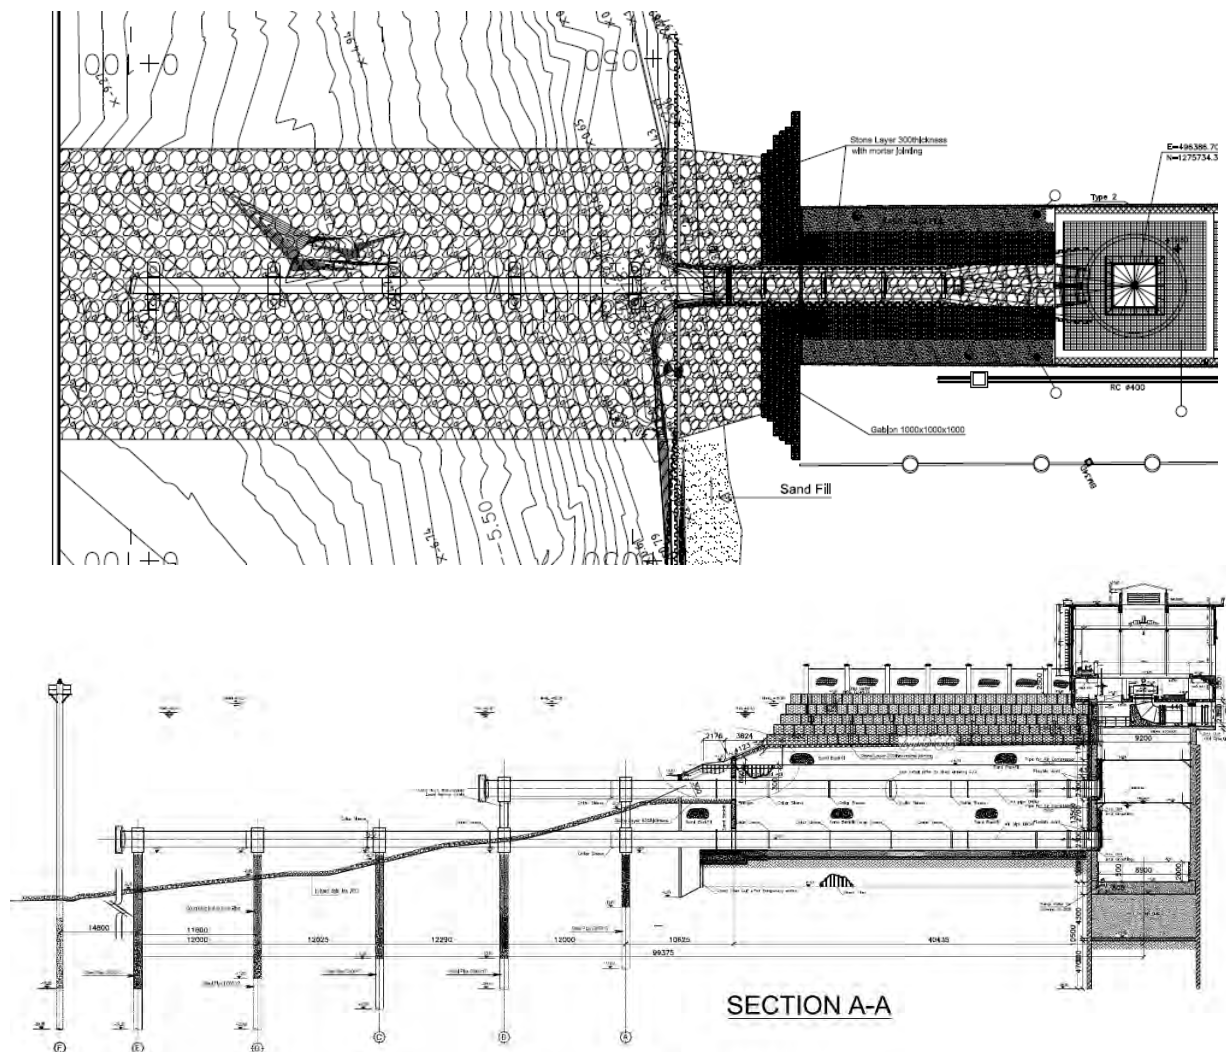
General Layout of Nirodh Raw Water Intake Facilities
